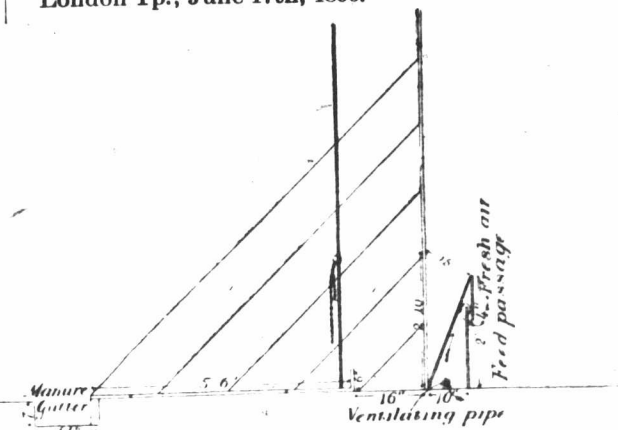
FIG. III.—CROSS-SECTION OF STALL, SHOWING THE PLAN OF VENTILATION.
